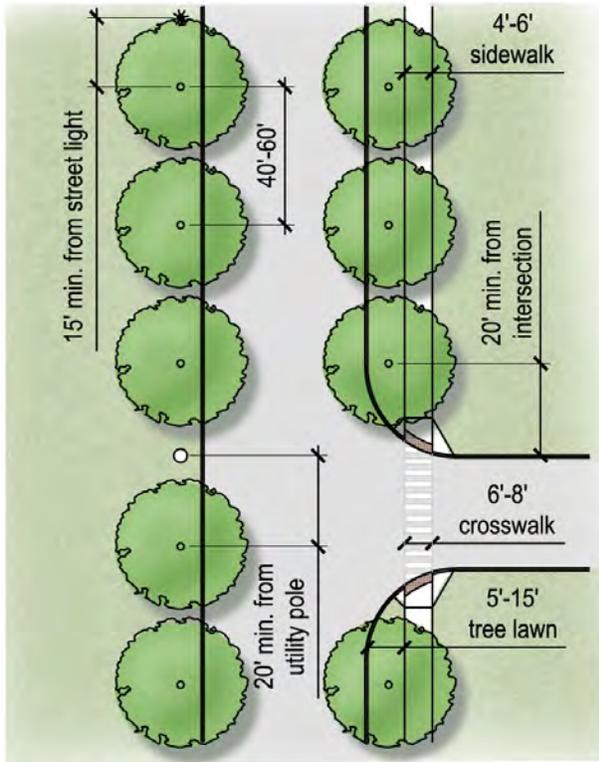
Typical Secondary Circulation Route Layout in Developed Areas.
